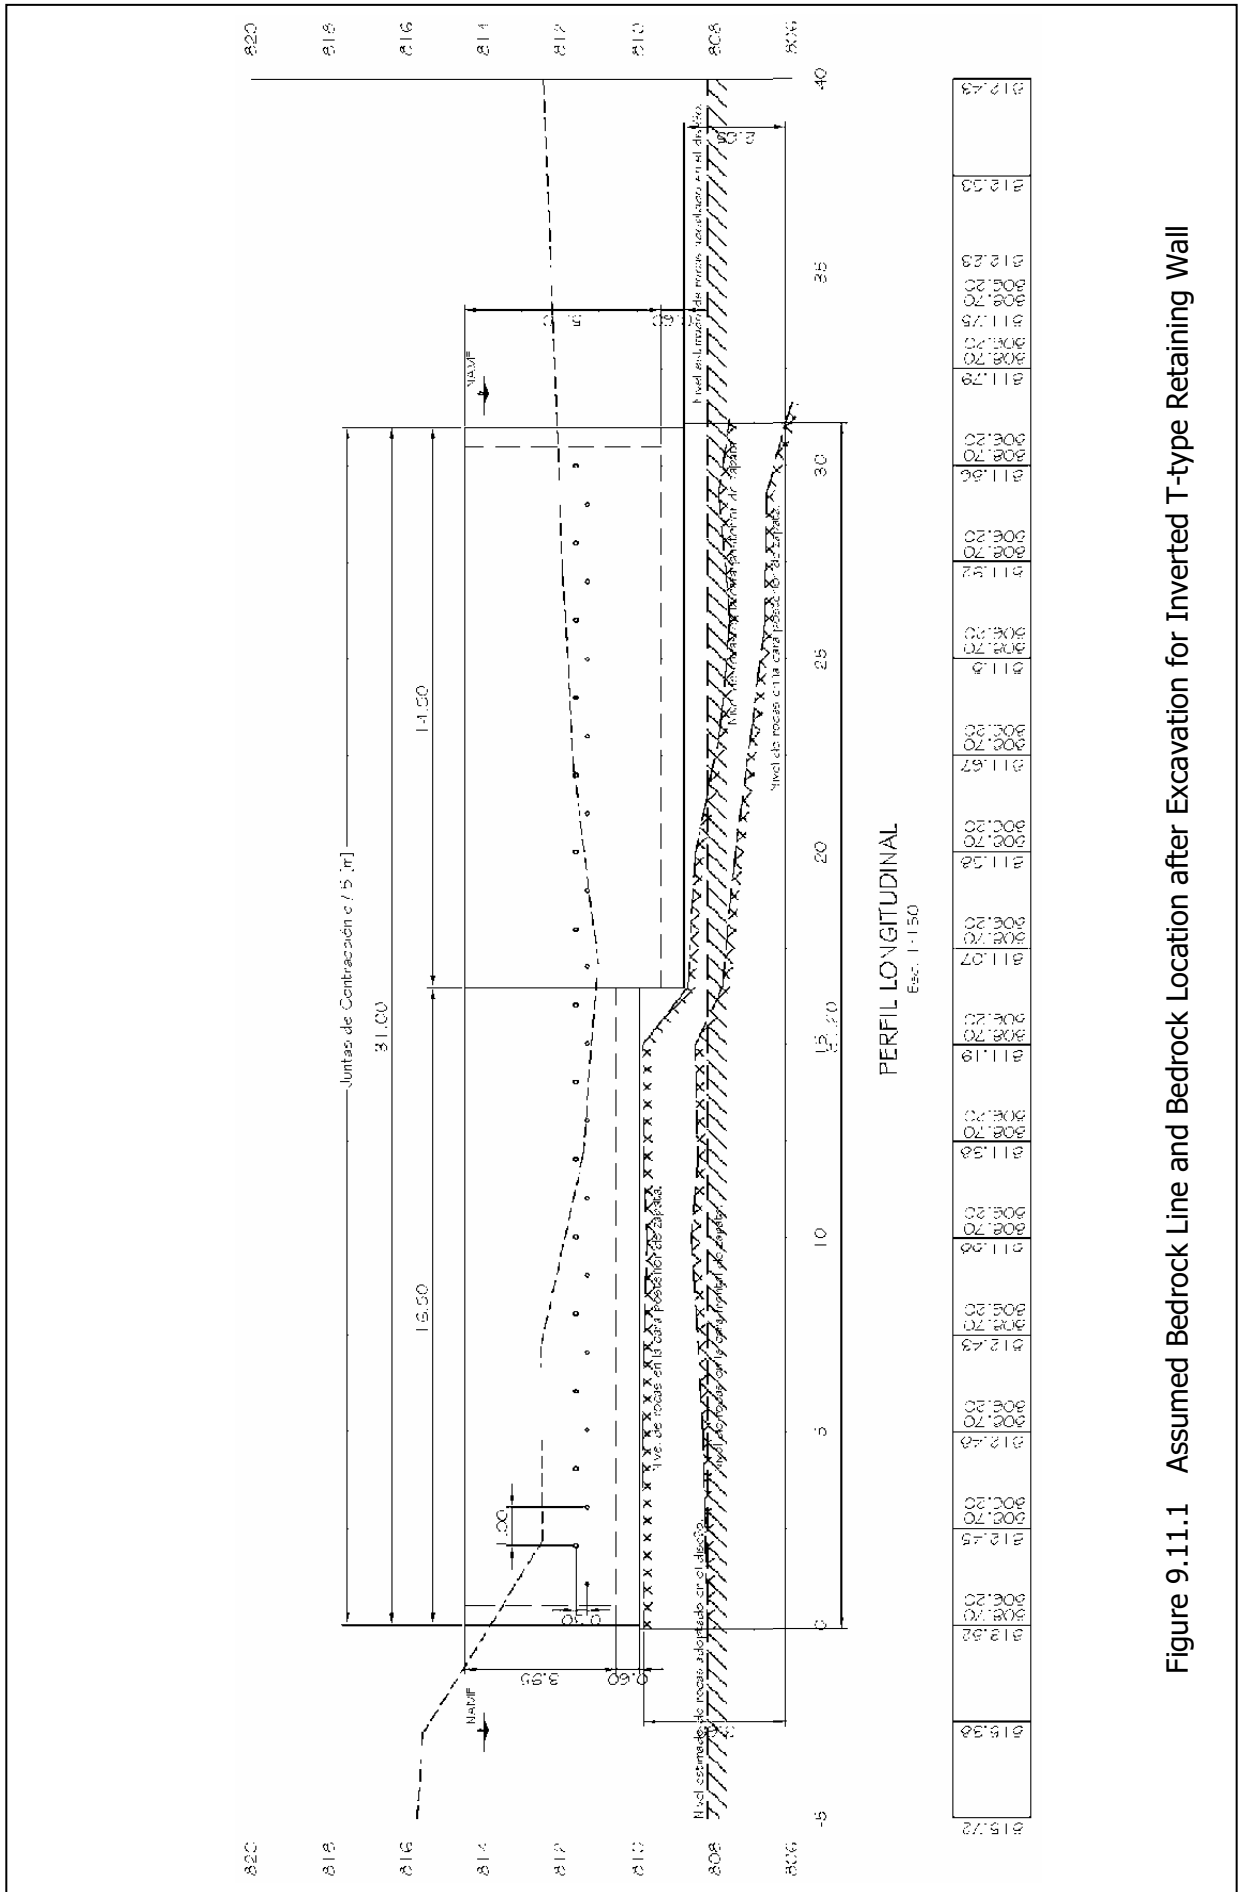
Assumed Bedrock Line and Bedrock Location after Excavation for Inverted T-type Retaining Wall
